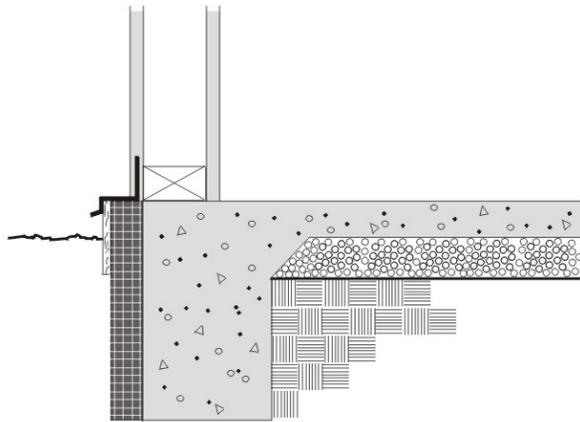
Unheated Slab-on-Grade Floor
